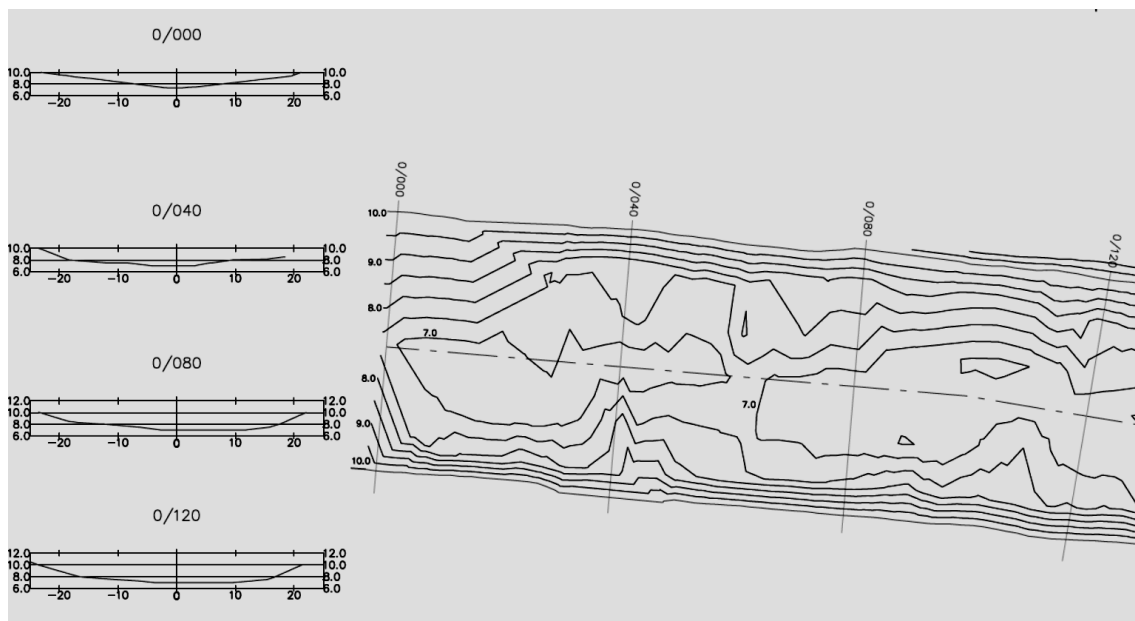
Cross sections and depth of Sävån at the proposed barrier location
